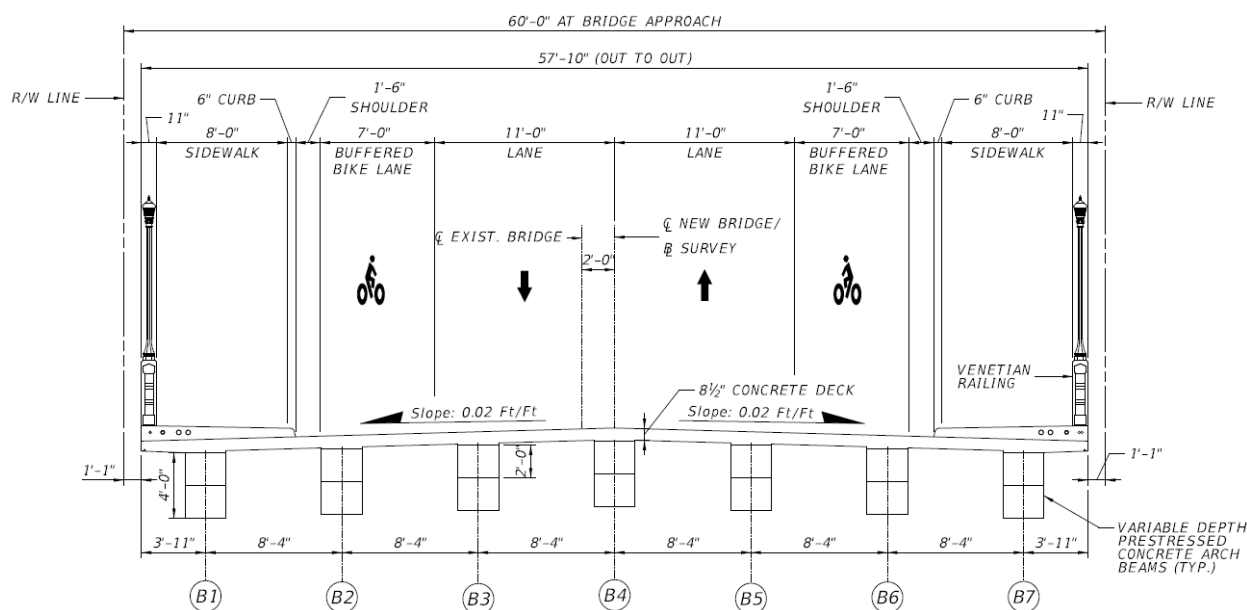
Replacement Alternative 7: Arched Beam Typical Section
